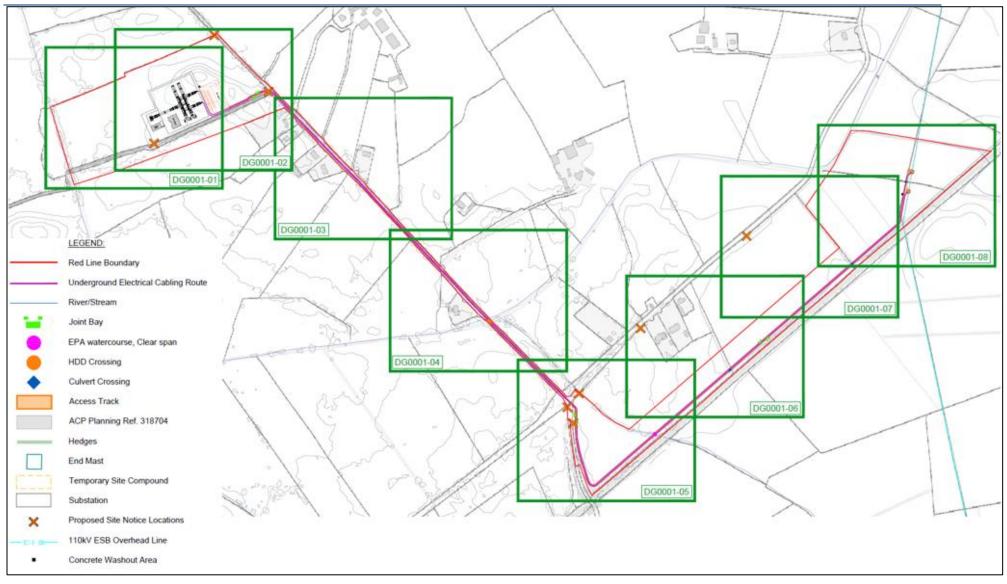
Site Layout Plan. Source: Drawing No. IE002700-RPS-00-XX-DR-Z-DG0001-00 prepared by RPS
